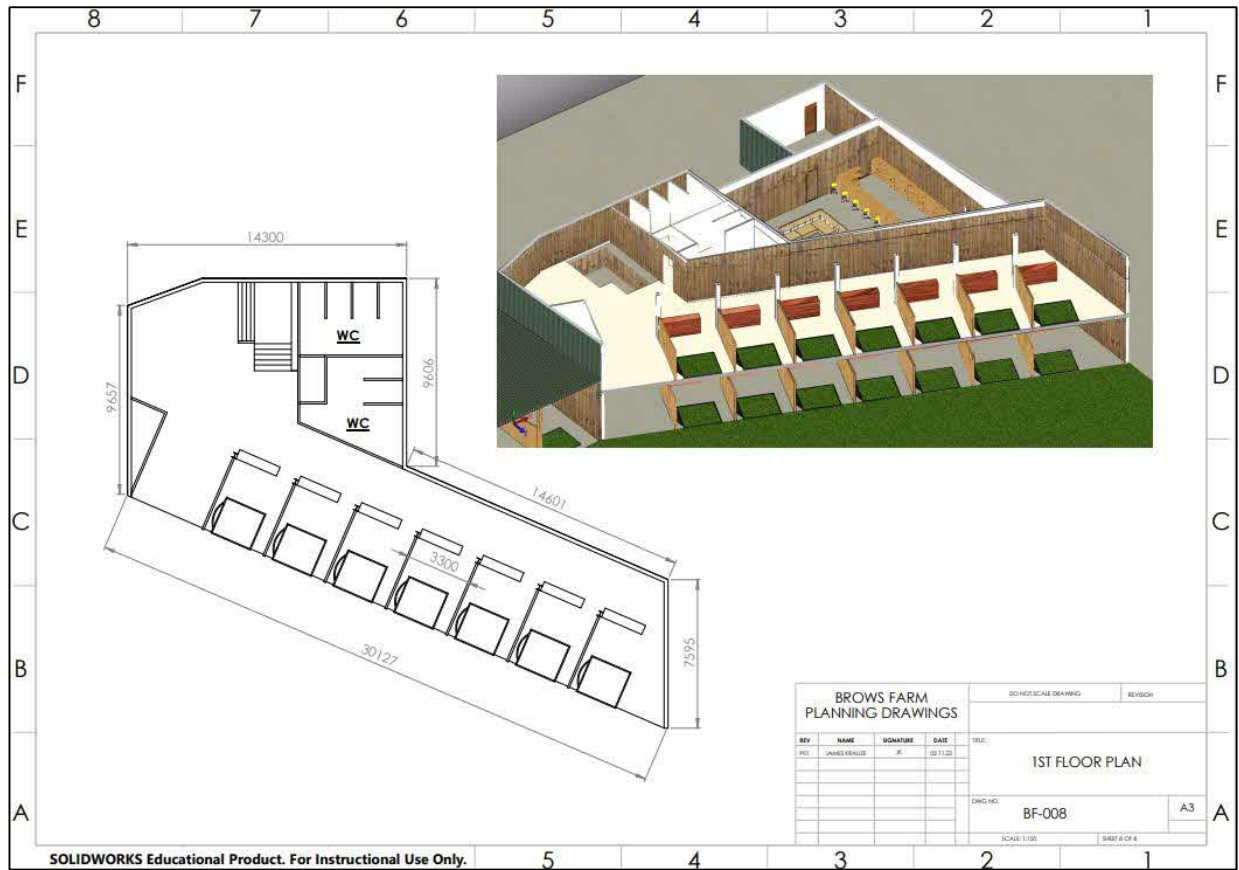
PROPOSED FIRST FLOOR PLAN
